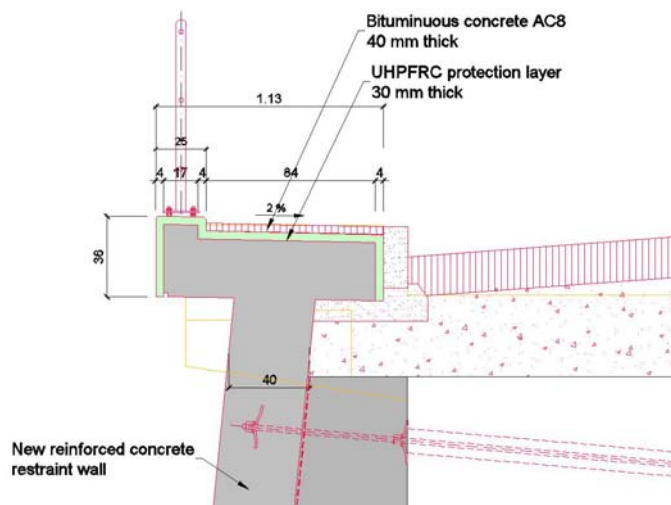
Cross-section of new sidewalk slab protected with a UHPFRC layer
